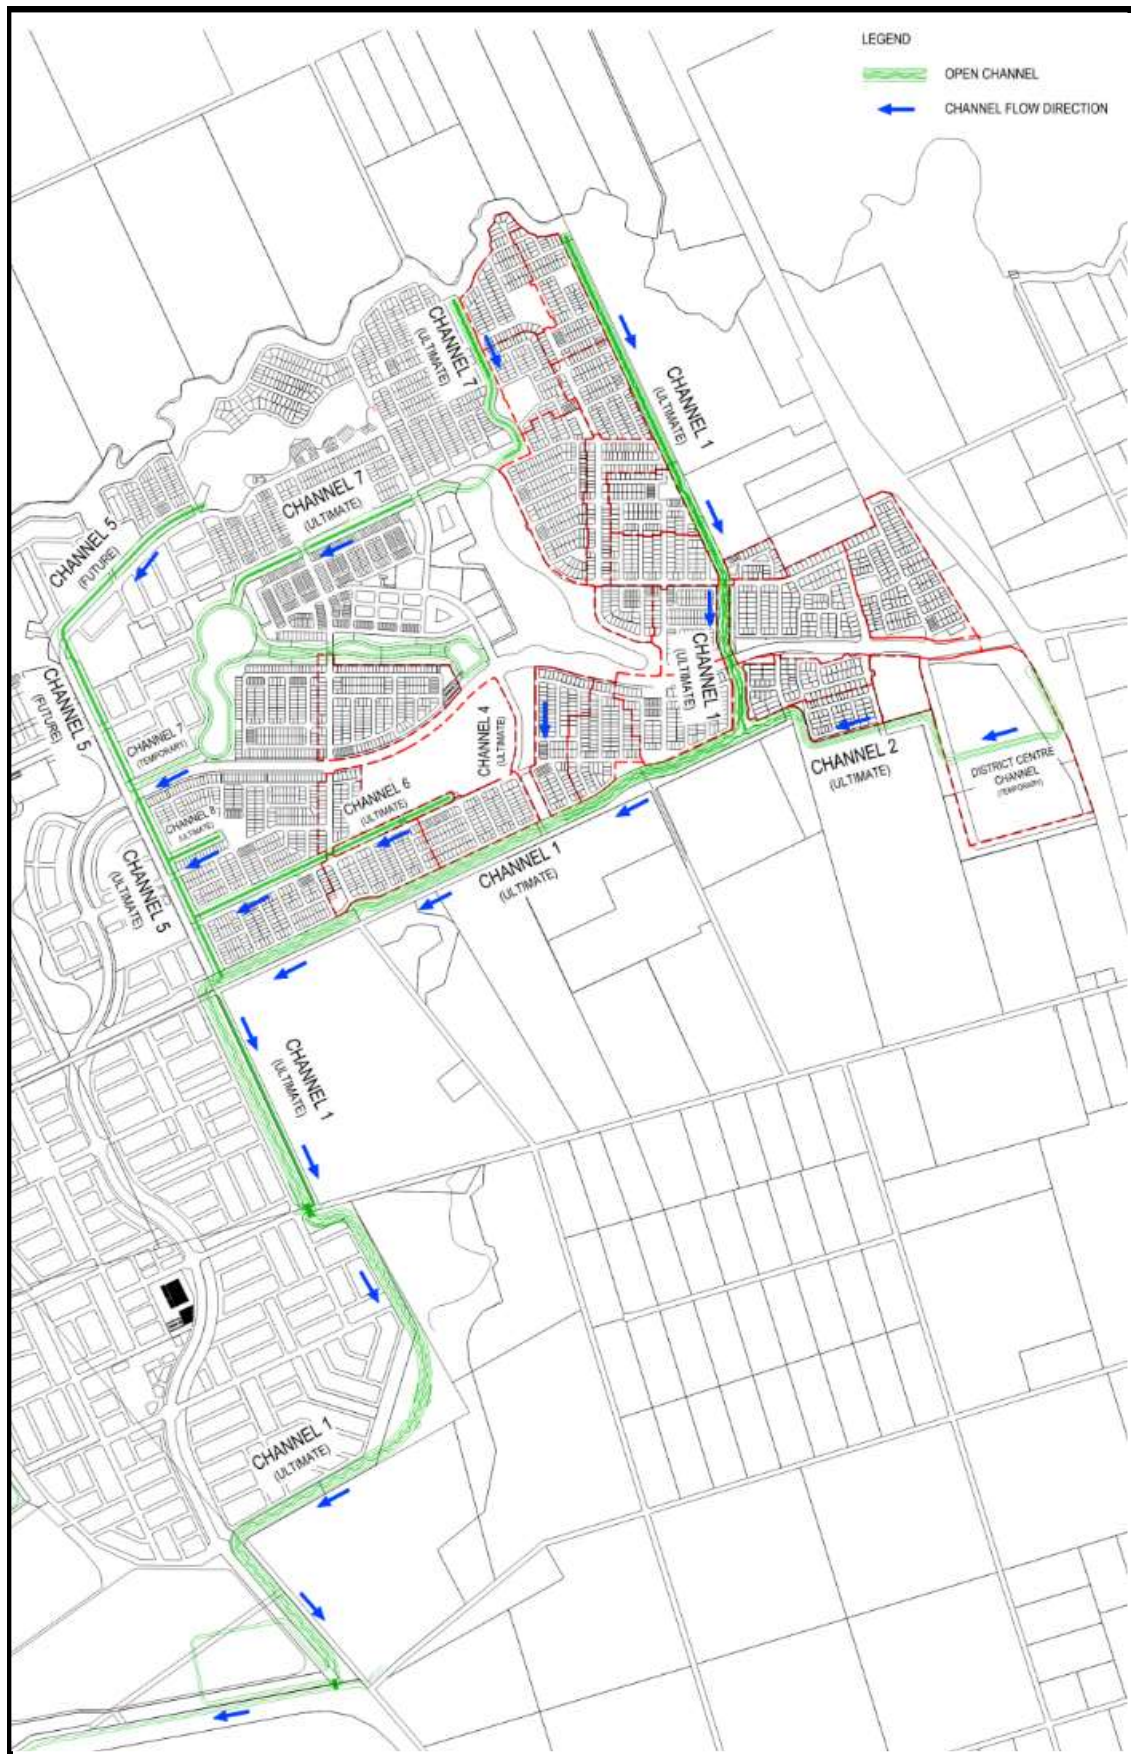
Extent of the Precincts 1, 2 and 3a – Interim Arrangement
